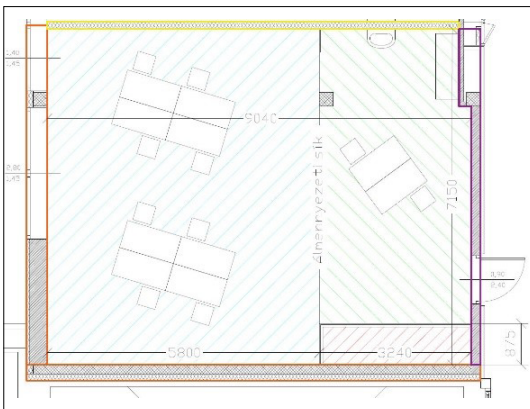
The design of the analysed room: Orange - external wall, Yellow - Internal wall facing the room, Purple - Internal wall facing the corridor, Blue - Ceiling height of 3 m, Green - Ceiling height of 2,5 m.
